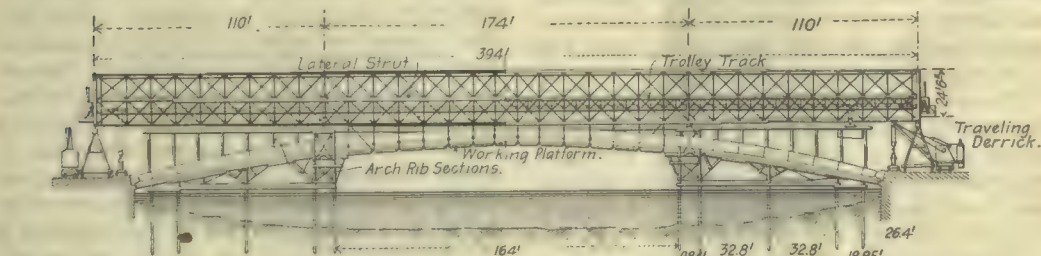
THE GENERAL PLAN OF ERECTION.
